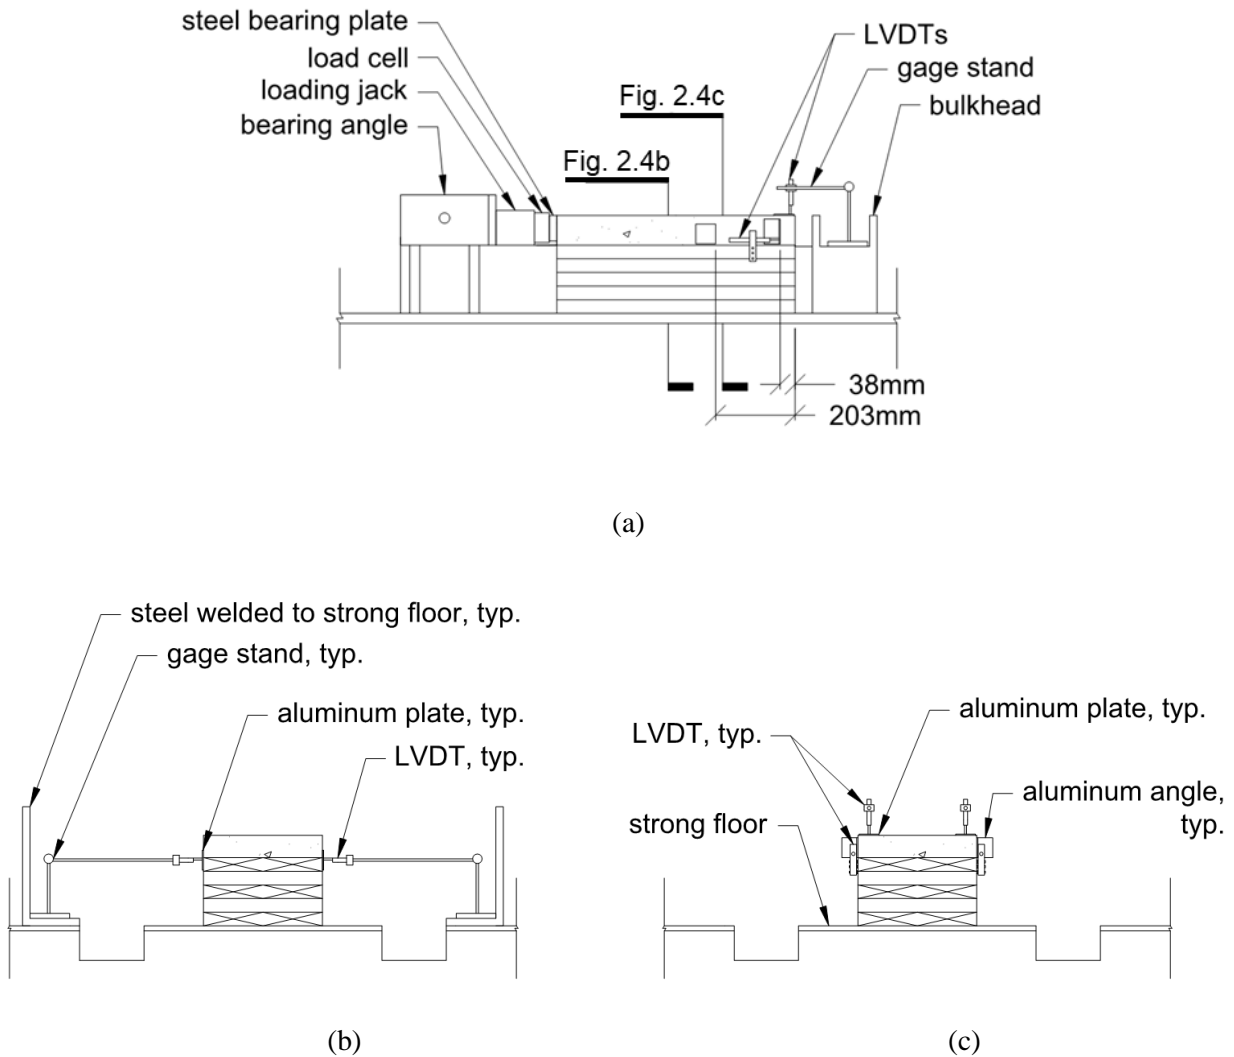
Test set-up for the CLT-concrete composite specimen (a) elevation view of test set-up, (b) section showing the location of LVDTs measuring the in-plane rotation of the specimen, and (c) section showing the location of LVDTs measuring uplift and horizontal movement of the timber relative to the concrete
